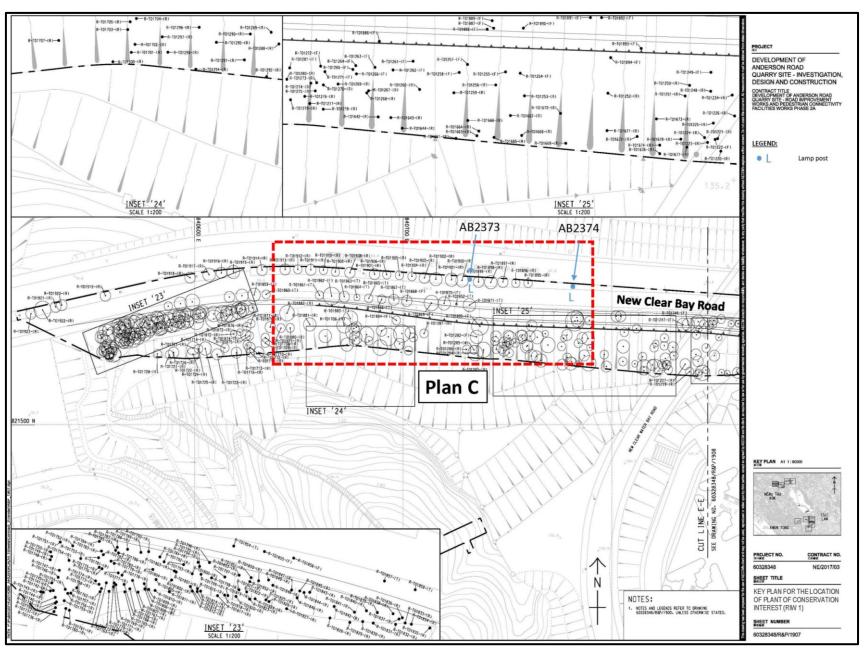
Project Site boundary at New Clear Water Bay Road/ Shun Lee Tsuen Road. Arrows indicate general photo view in Plate 1.
